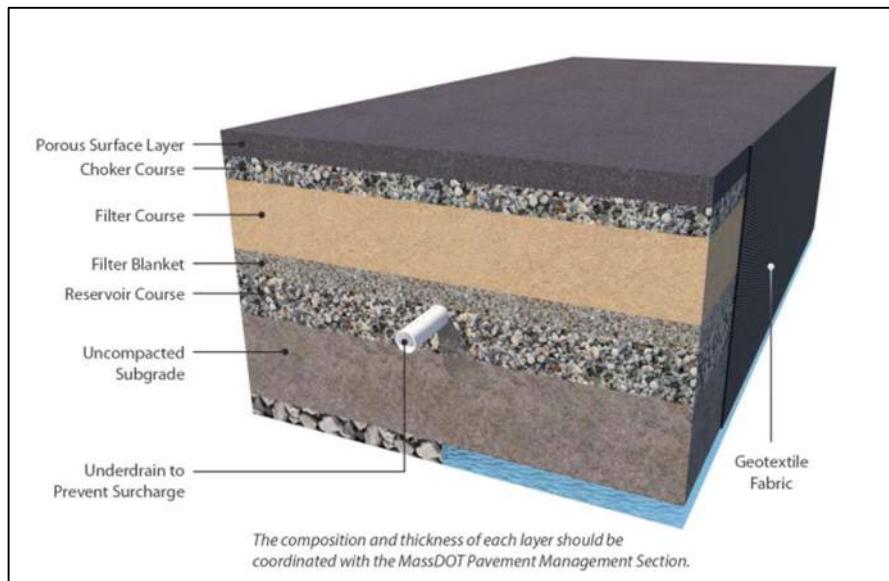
Example of Permeable Pavement Cross Section. Source: MassDOT Stormwater Design Guide (2023 Ed.)
